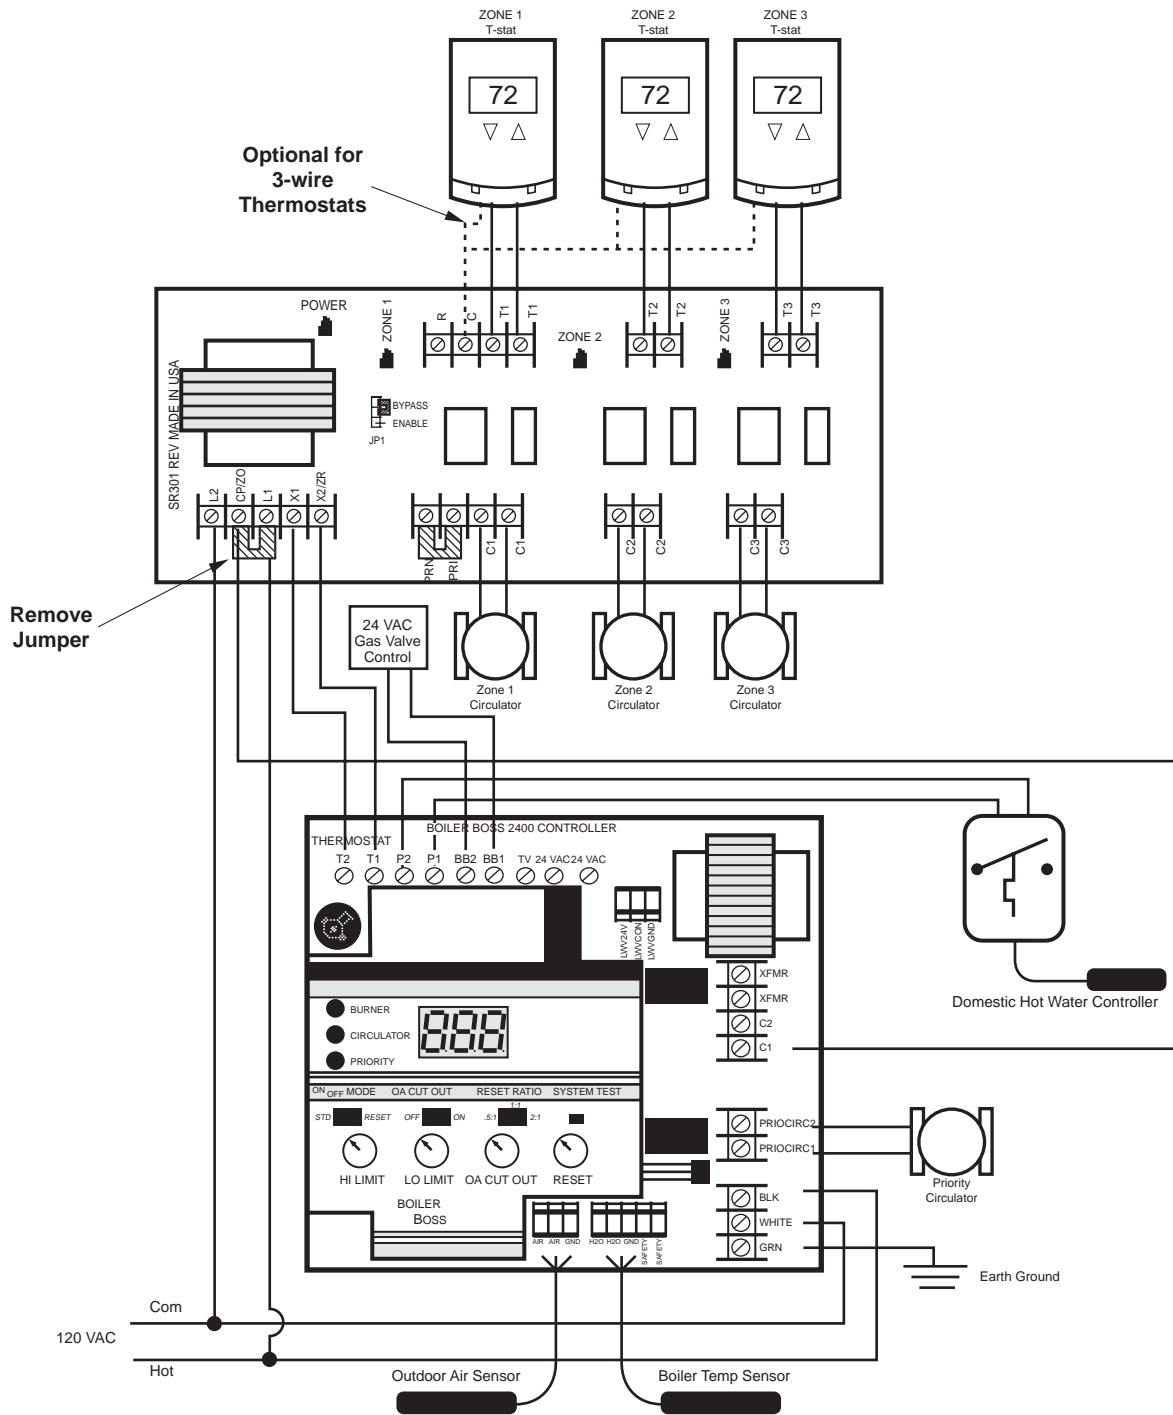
Typical Wiring for Boiler Boss 2400-3.
